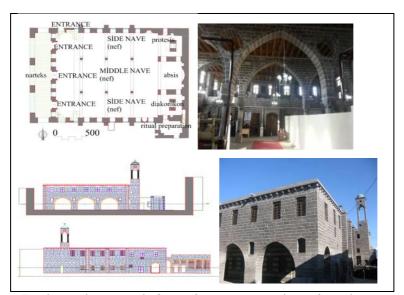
Floor Plan, north front (D.V.B.M. archives) and interiors
